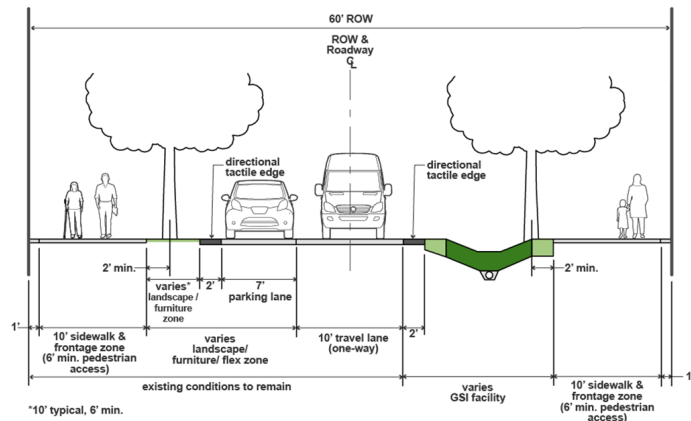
C Curbless Urban Village Neighborhood Access street type 60' ROW. Cross section showing where bioretention bulbs out into the flex zone/planting strip.
